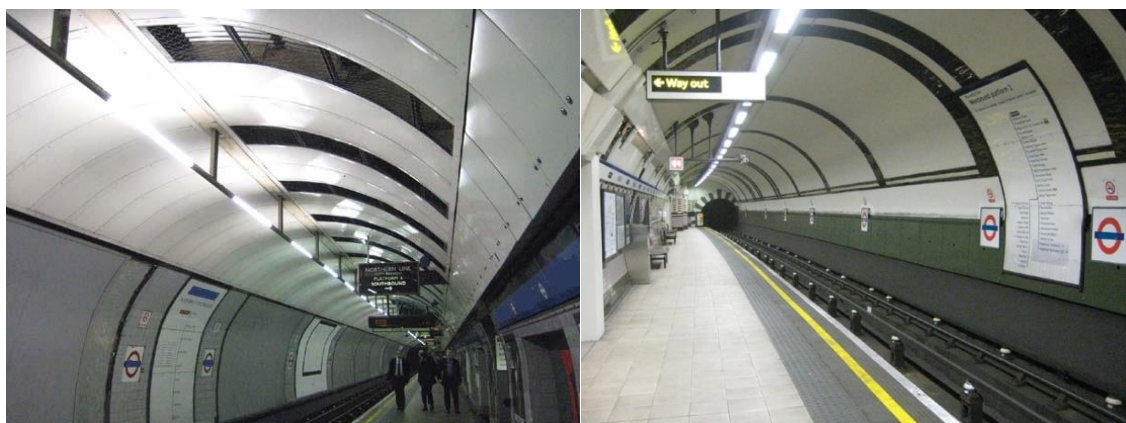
Station platform featuring metal panel cladding on the ceiling (left) and bare ceiling (right)
